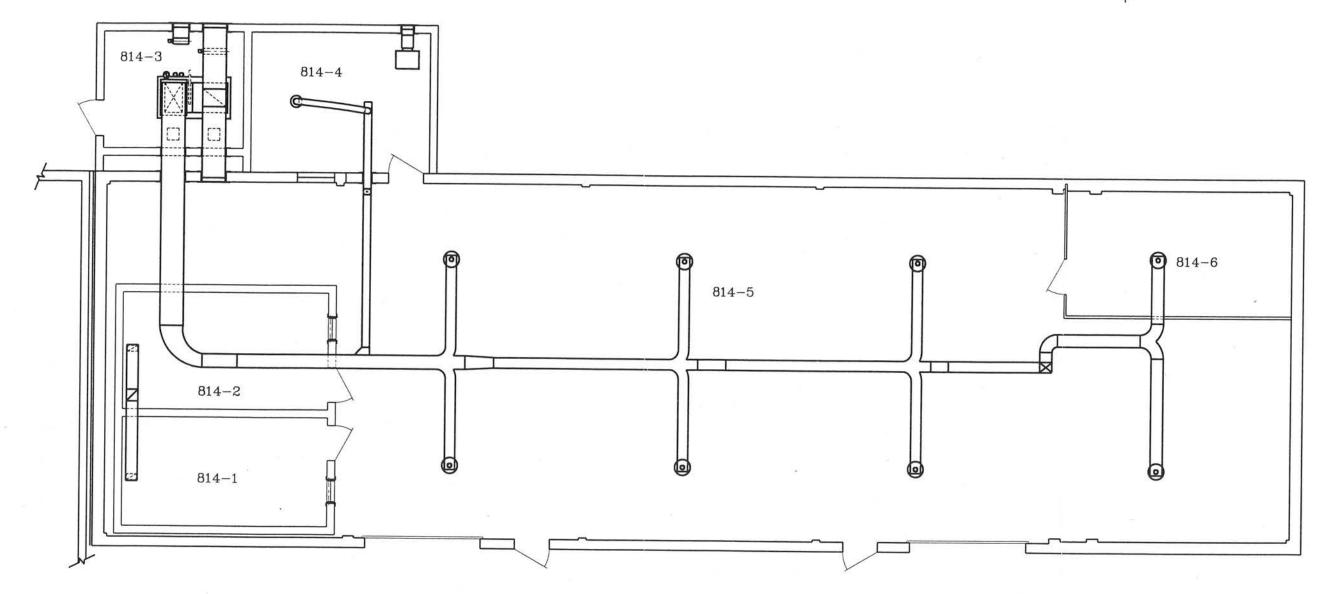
FLOOR PLAN- BUILDING 813
